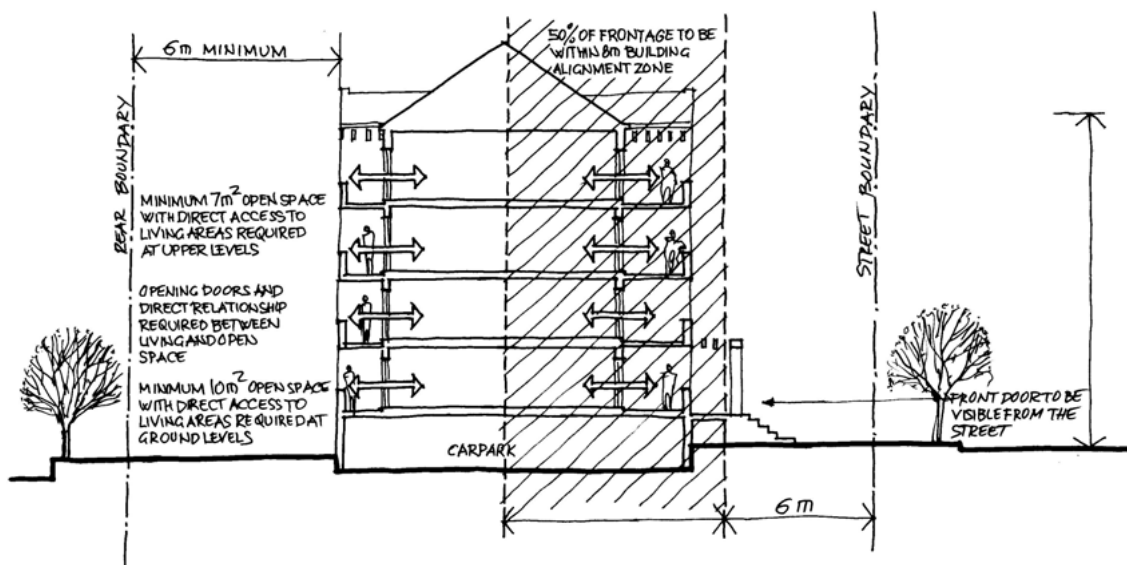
Cross section - residential flat building.
